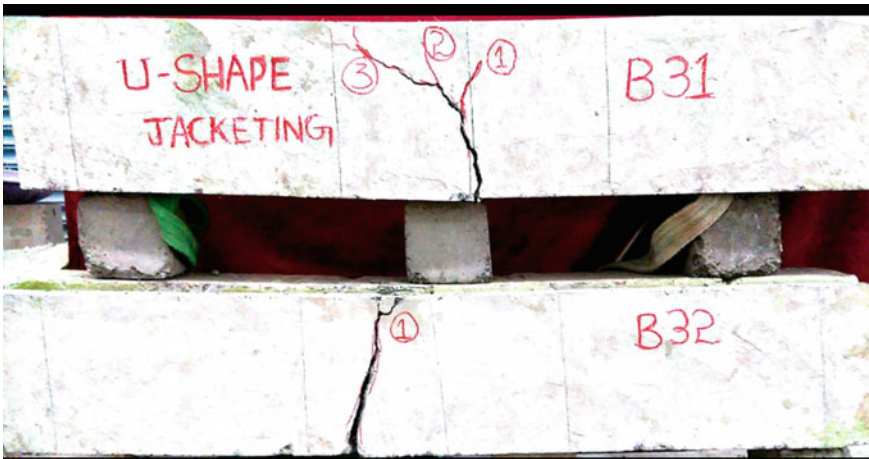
Crack pattern for RC beam with U-shape jacketing
